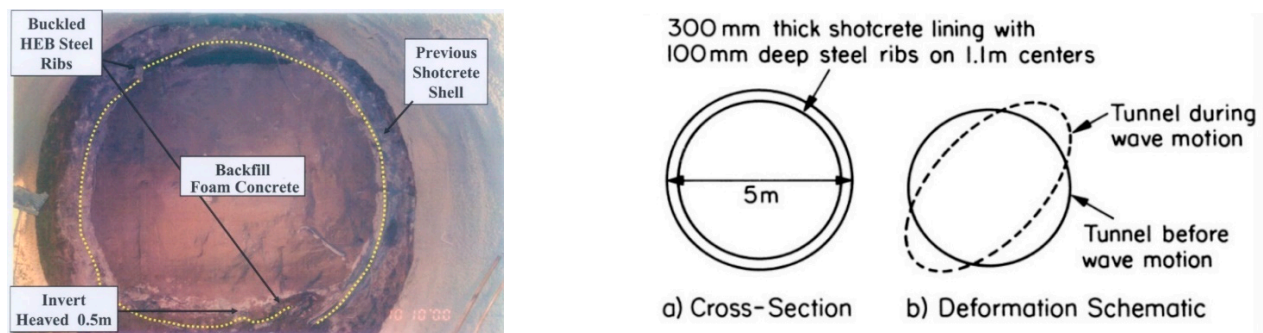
View of the collapsed tunnel after it had been re-excavated and back-filled with foam concrete [8] and bench pilot tunnel cross-section and seismic distortion [32].
